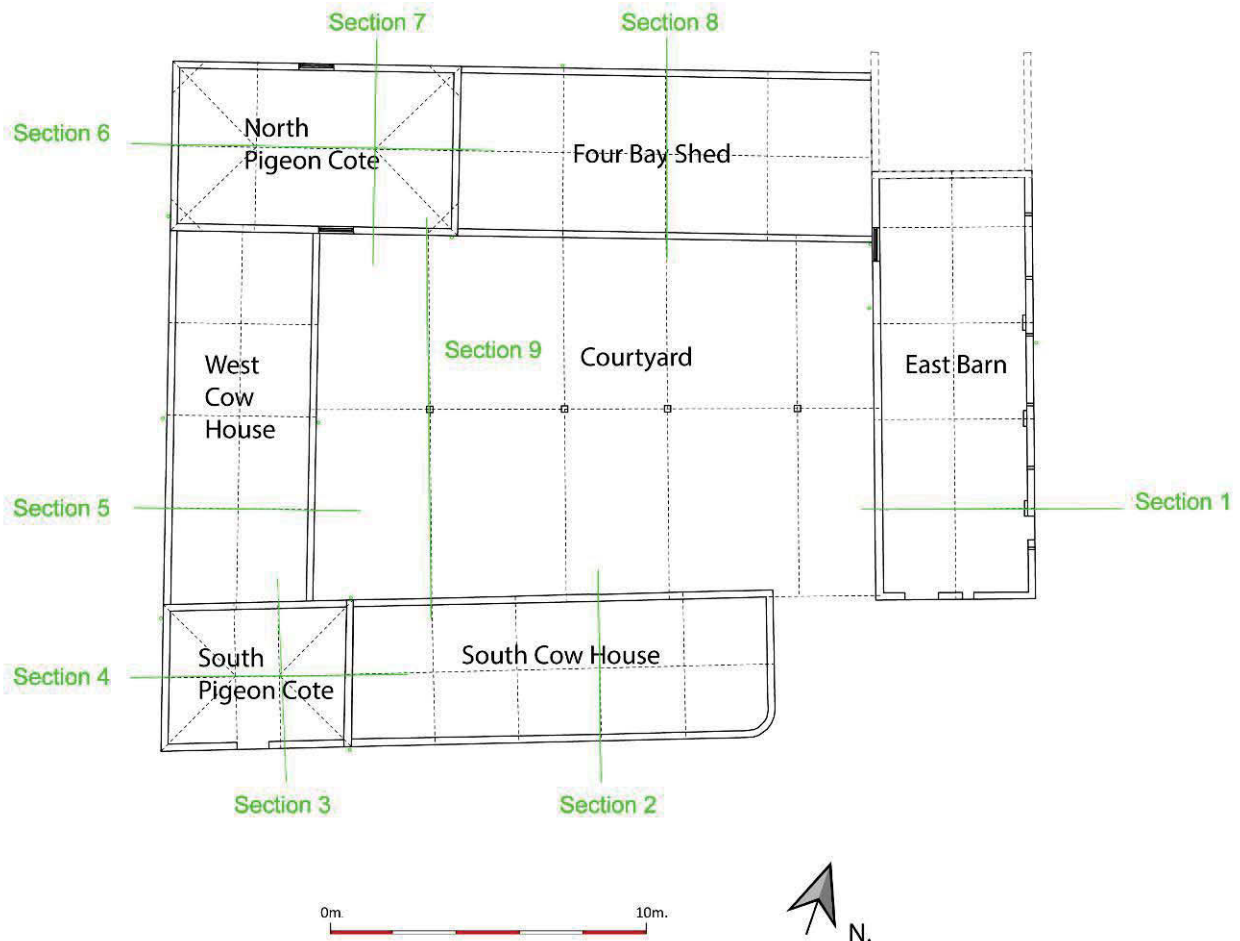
Plan of the site and location of the section drawings in relation to the buildings.
